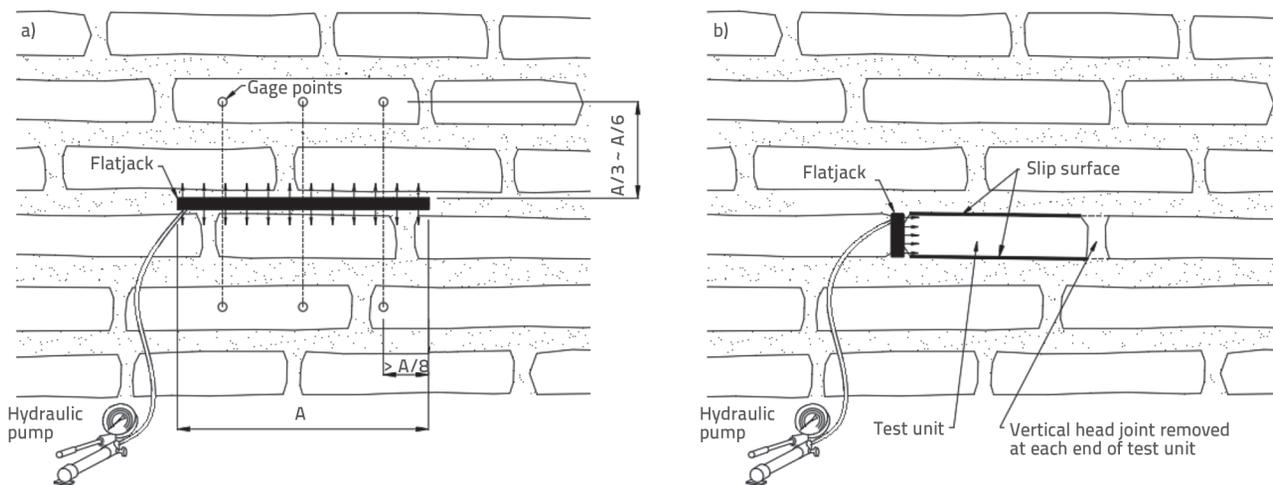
Flat-jack and shear test: a) Single flat-jack test setup b) Shear test setup
